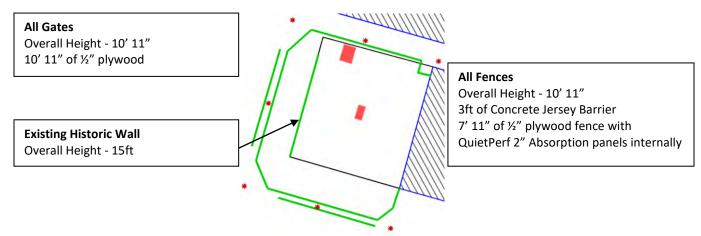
Details of Perimeter Fence Construction to Achieve Regulatory Requirements
